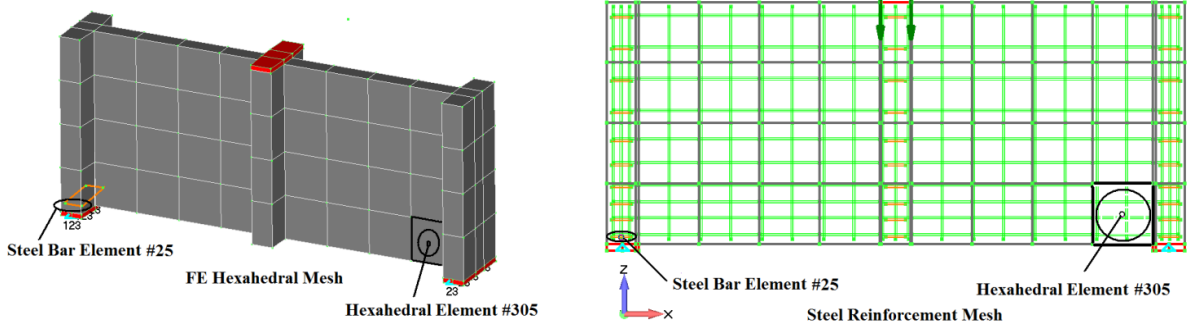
Concrete FE mesh and steel reinforcement rebars of a shear wall [8].
